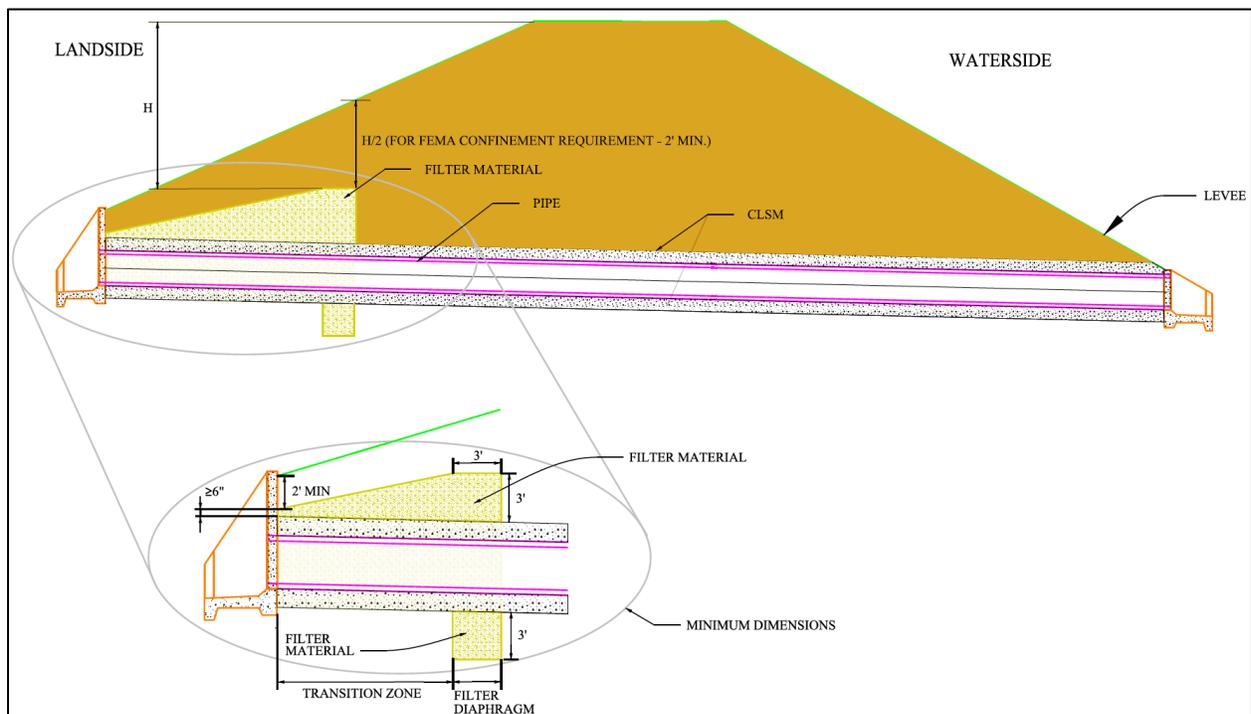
Elevation view of pipe and landside internal seepage filter.
